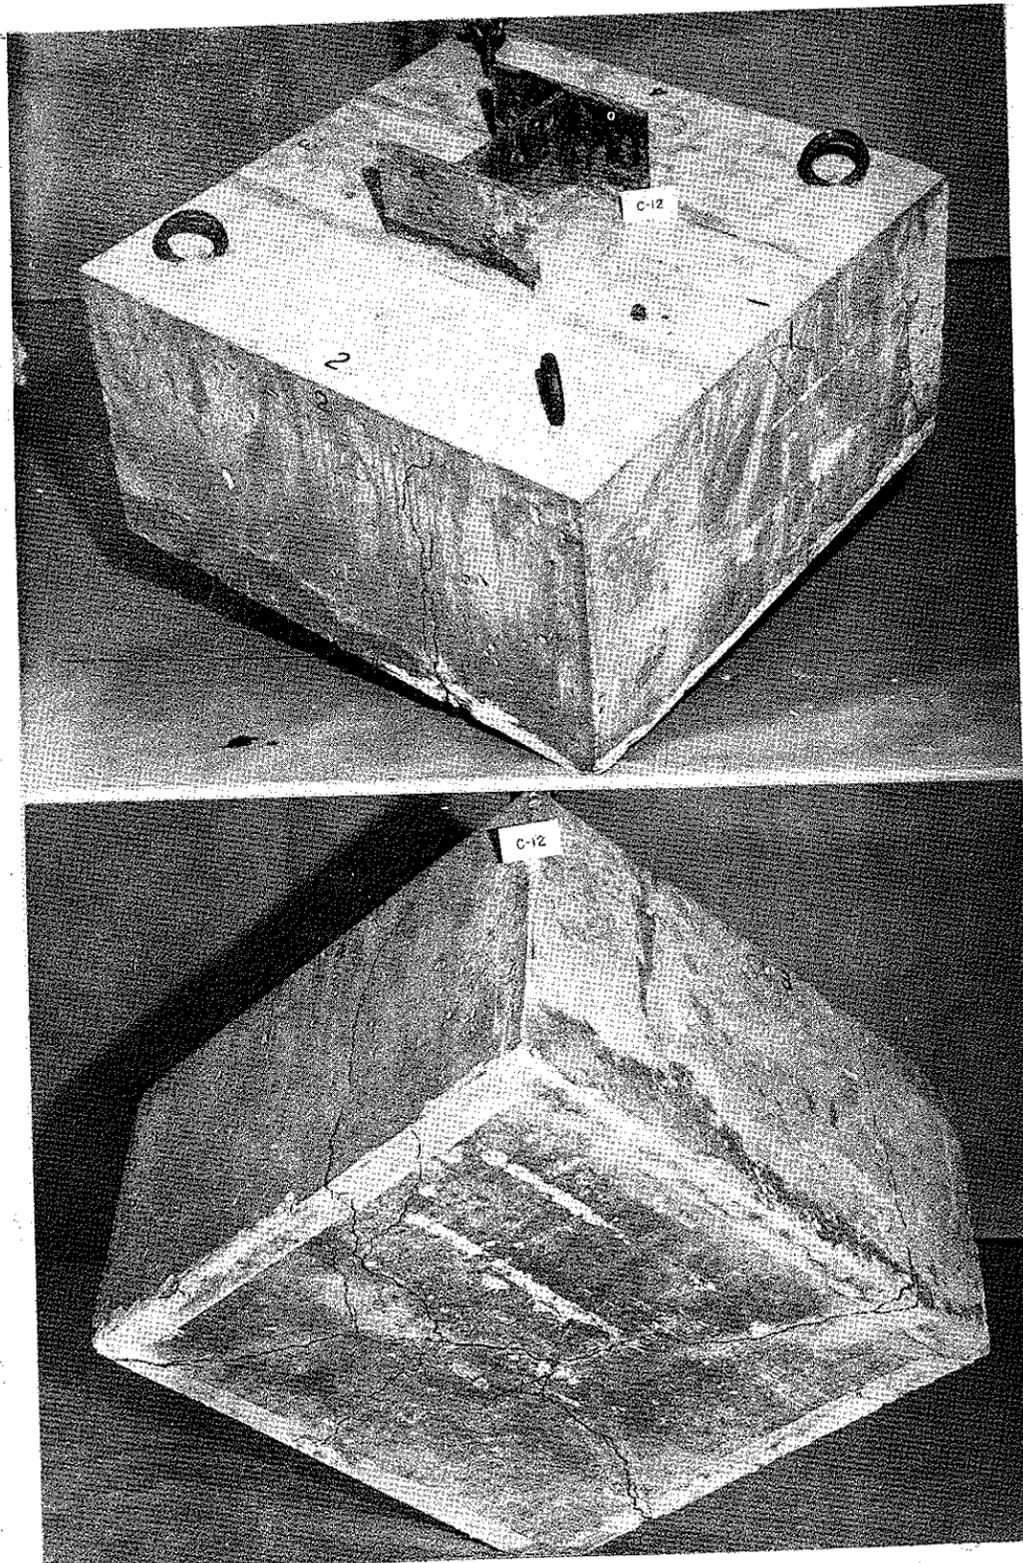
APPEARANCE OF SPECIMEN C-12 AFTER TESTING.
